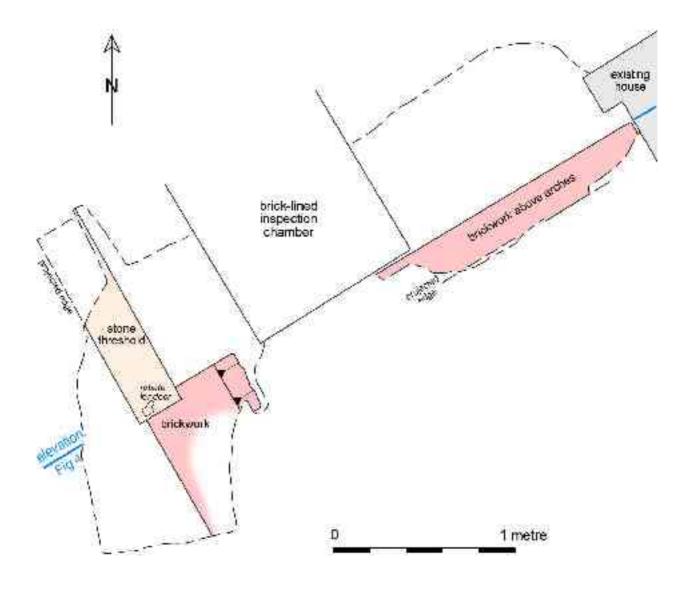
1:20 plan of Trench 1 showing the brick wall foundations and stone threshold for a doorway at the northwest corner of the main building, plus location of the drawn elevation (Figure 4)
